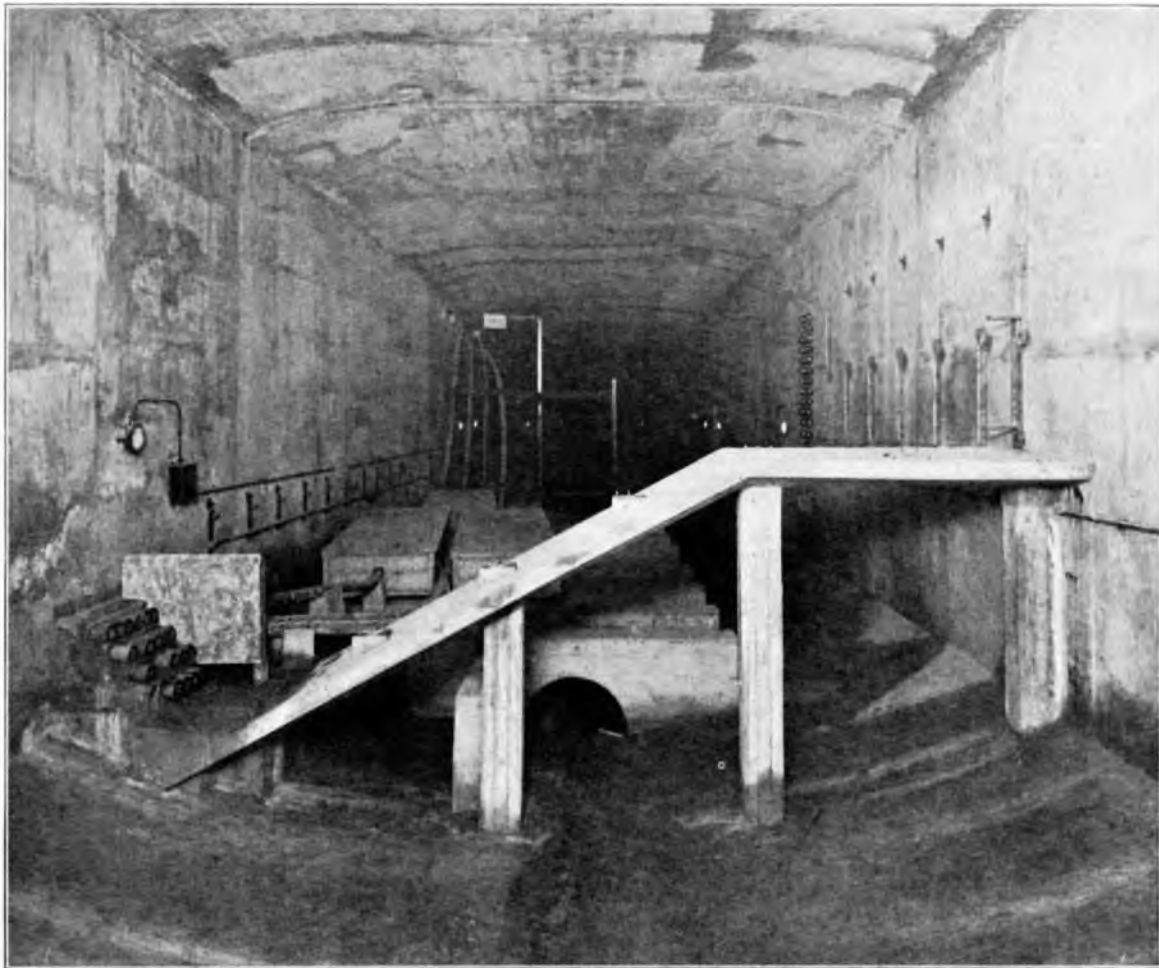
CONCRETE BRIDGE, PIPES, AND BEARERS IN UNDER-ROAD AT GEORGR'S DOCK, POINT I.
